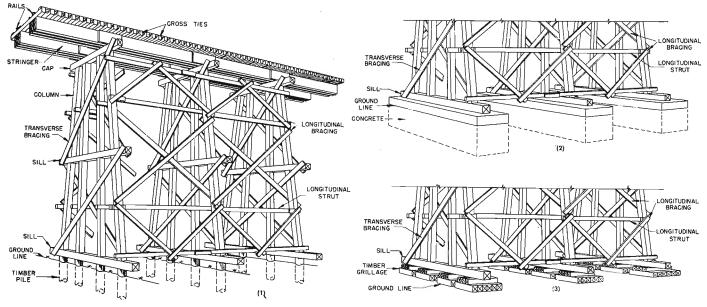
Railway bridge, timber stringer spans, framed timber tower:
